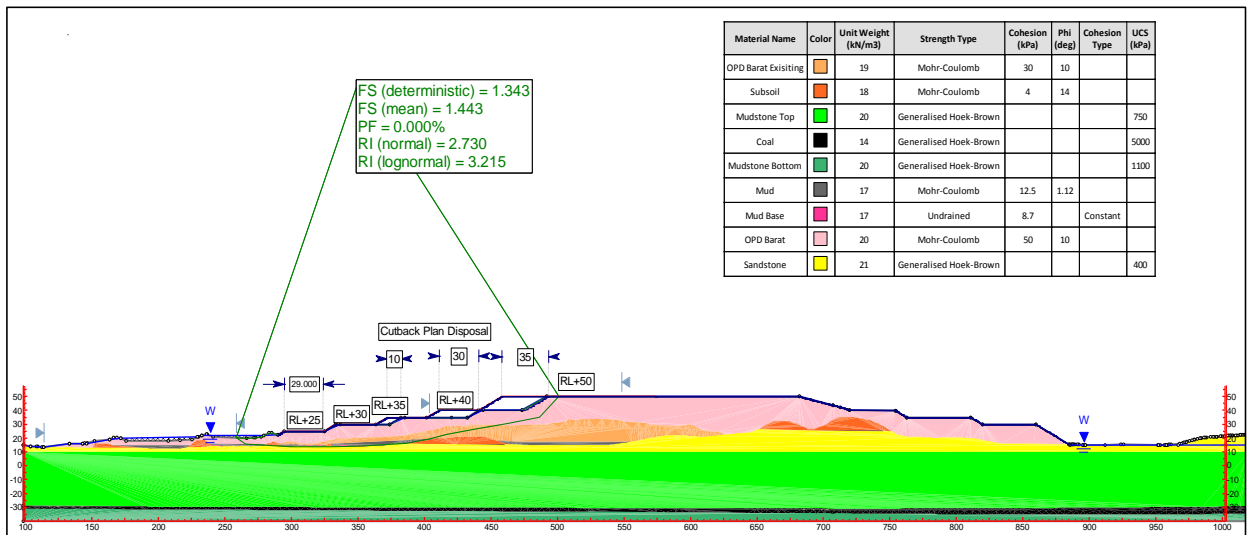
West Out Pit Dump Disposal Optimization Recommendation
